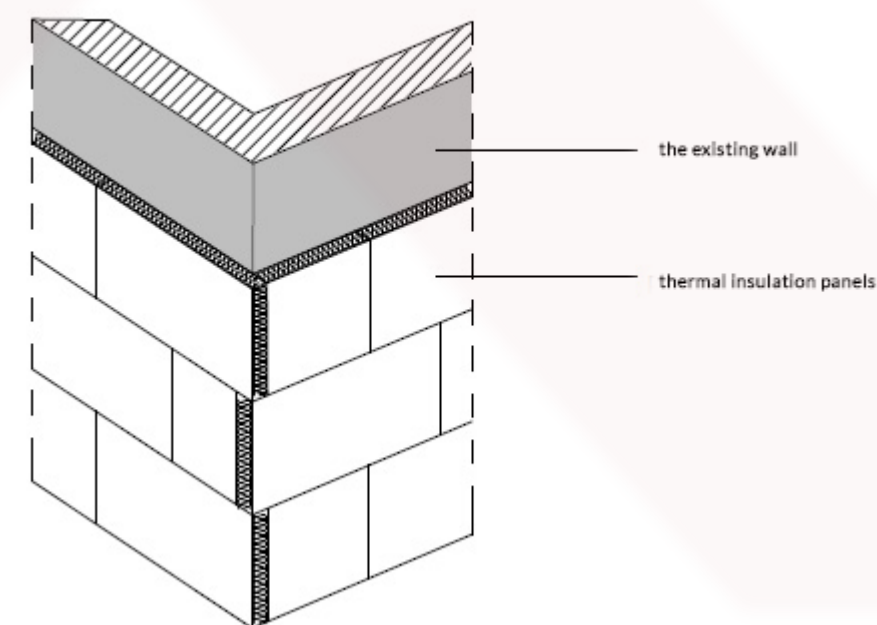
The arrangement of insulation panels at the corner of the building.
